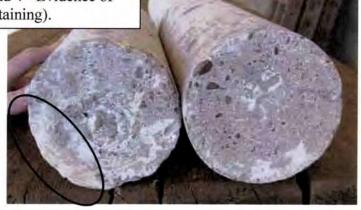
Core 2, Segments 4 and 5 - Smooth finish shows evidence of a joint. Silica gel forming in concrete.
